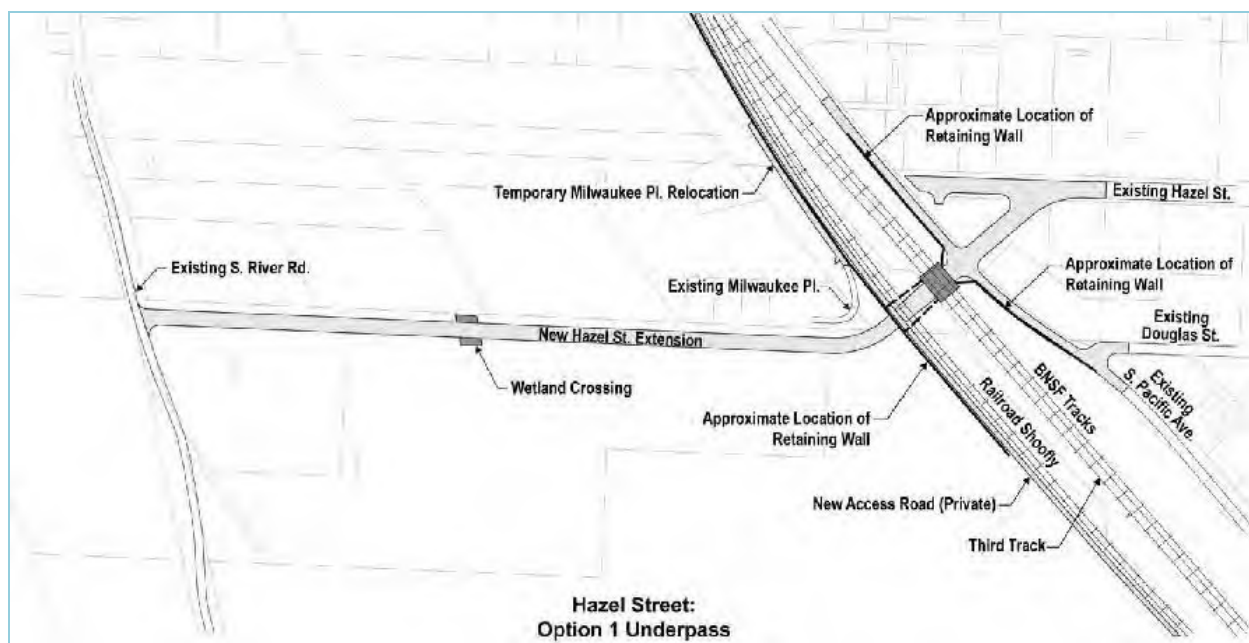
Option 1: Hazel Street Alignment Undercrossing
